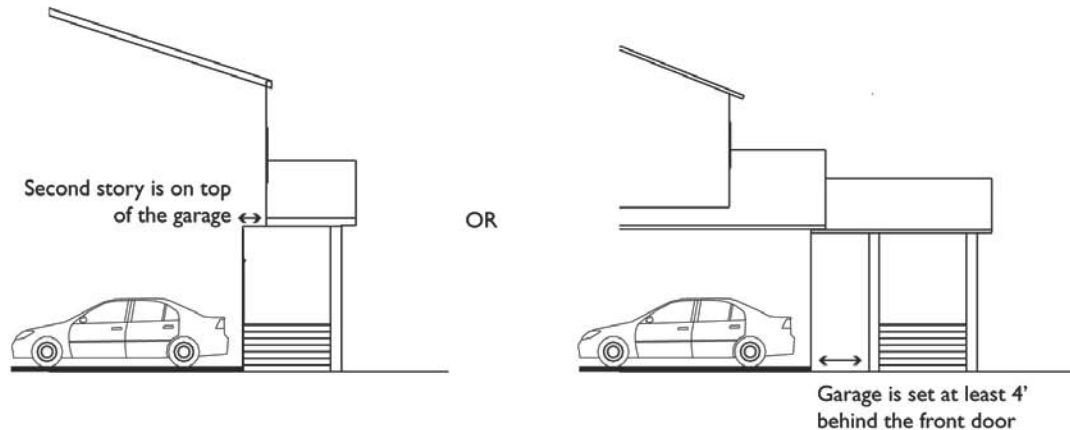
and 2.4-6: Garages and Garage Width Exceptions
